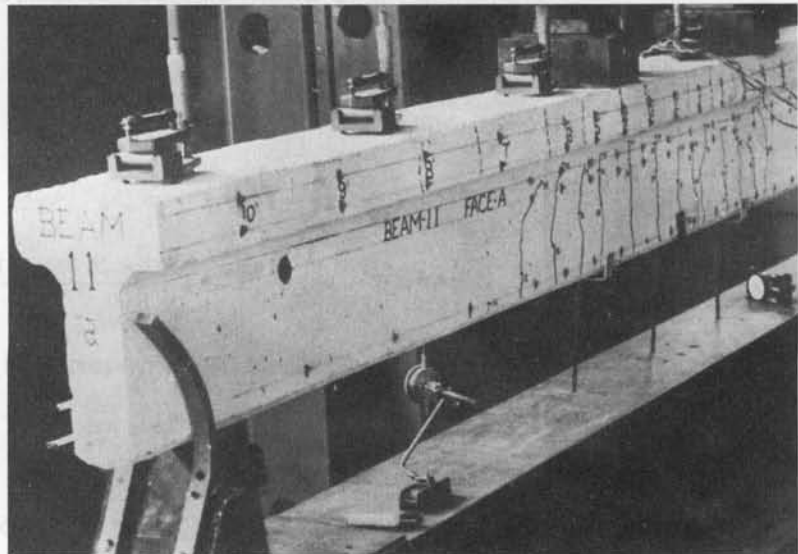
Crack development in prestressed T-beam (Nawy et al.).
